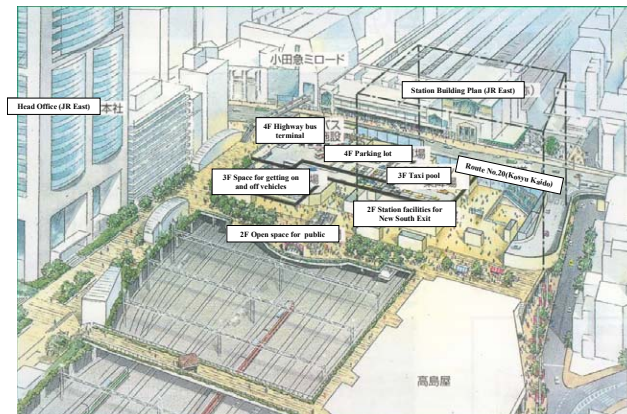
Image of the Project "Renovation of the Urban Structure in the South area of Shinjuku Station"
